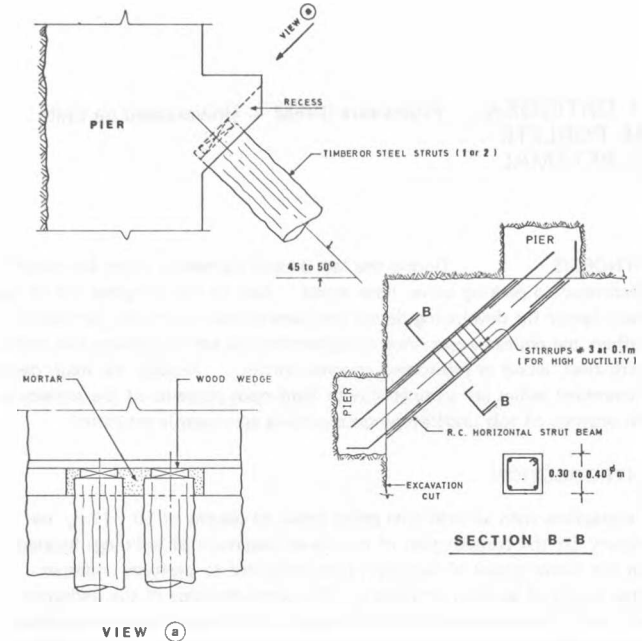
Details of Strut - Pier Connections and R.C. Corner Struts.
